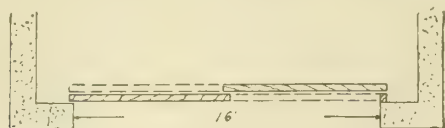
FLOOR PLAN, PARALLEL SLIDING DOORS
